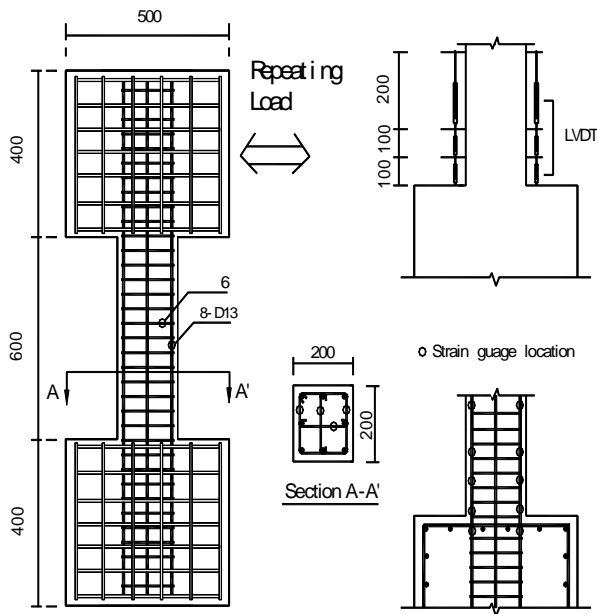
Detail of Specimens and gaging arrangements (Unit : mm)
